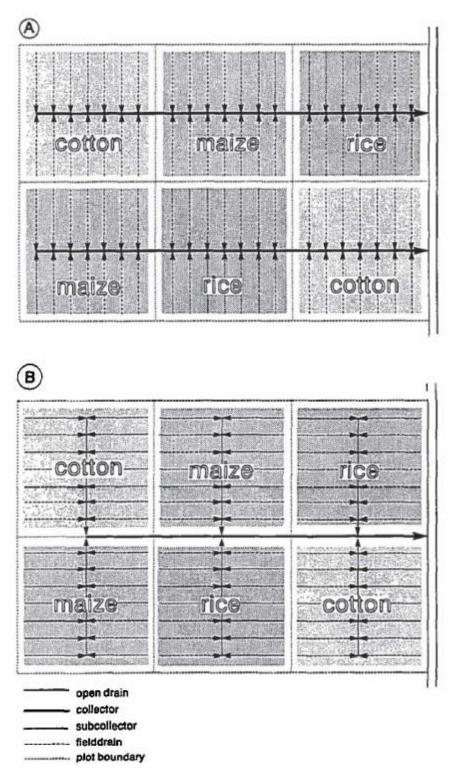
Layout of conventional and modified drainage systems (Cavelaars et al., 1994).A: Conventional layout, not adapted to the cropping units B: Modified layout, adapted to the cropping units.
